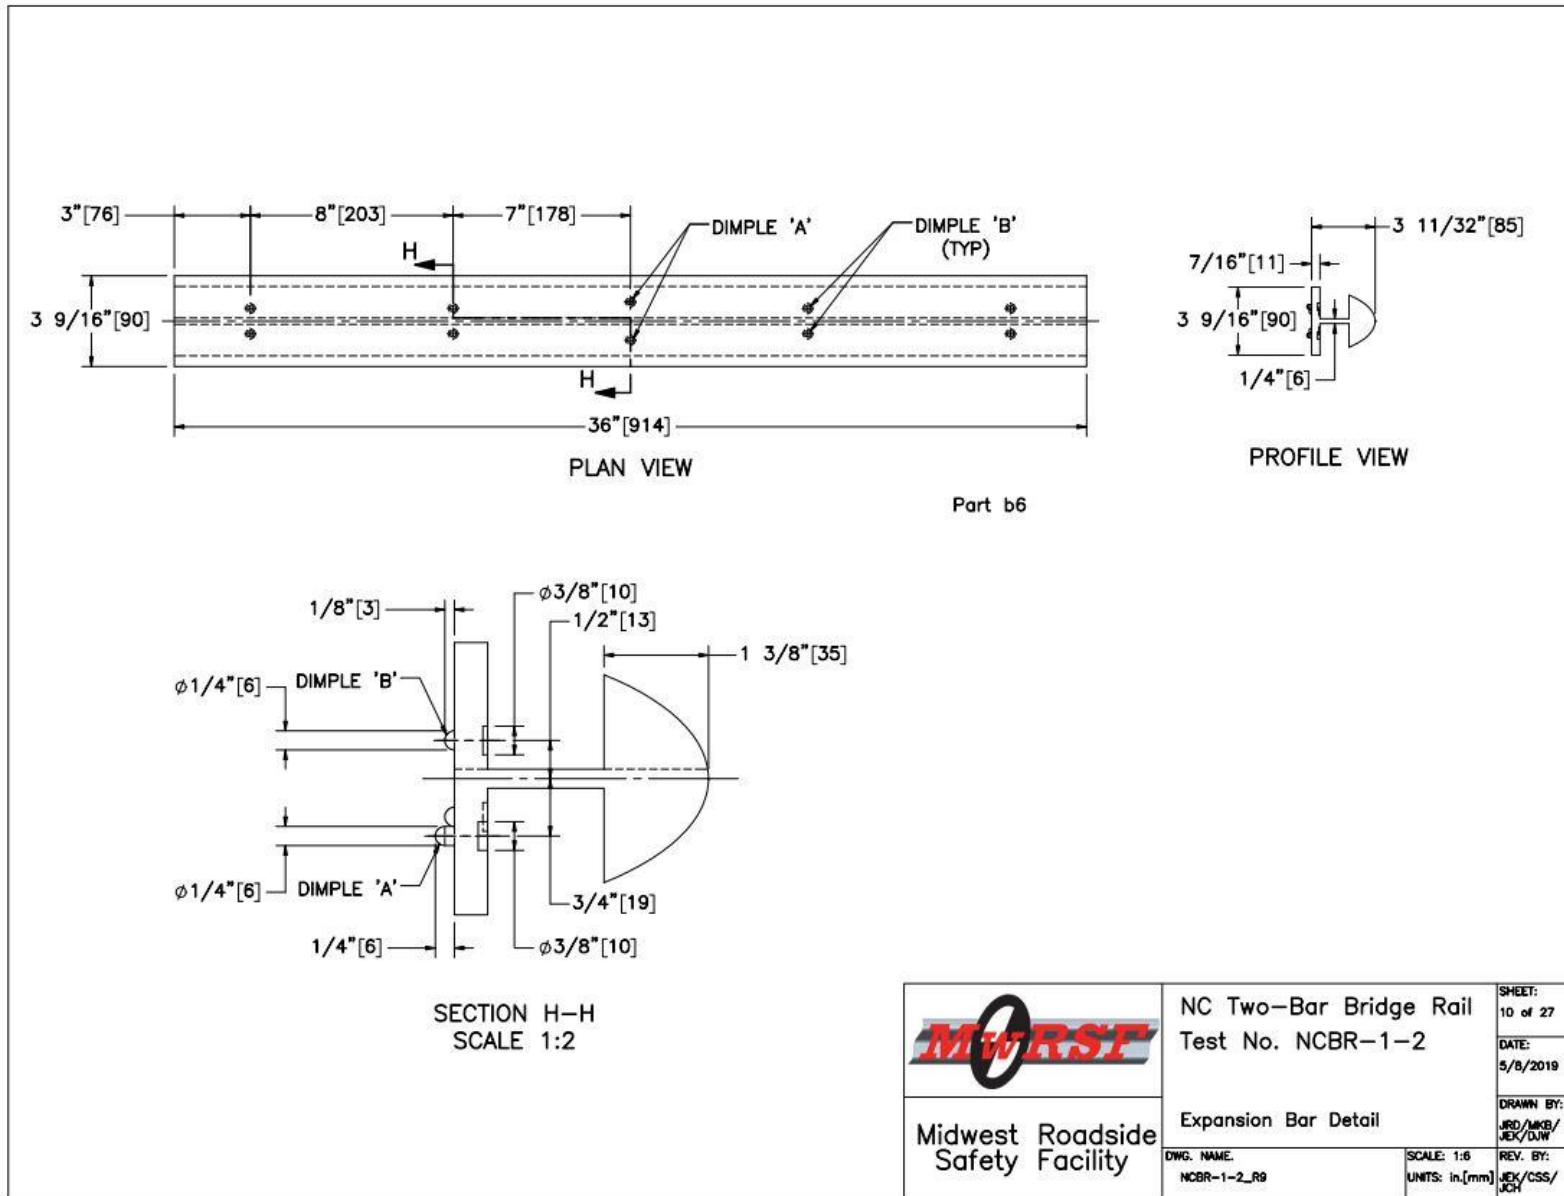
Expansion Bar Detail, Test Nos. NCBR-1 and NCBR-2
